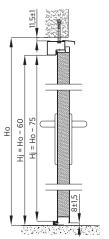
Installation of a single-leaf door with an internal frame to a masonry wall – vertical cross-section
